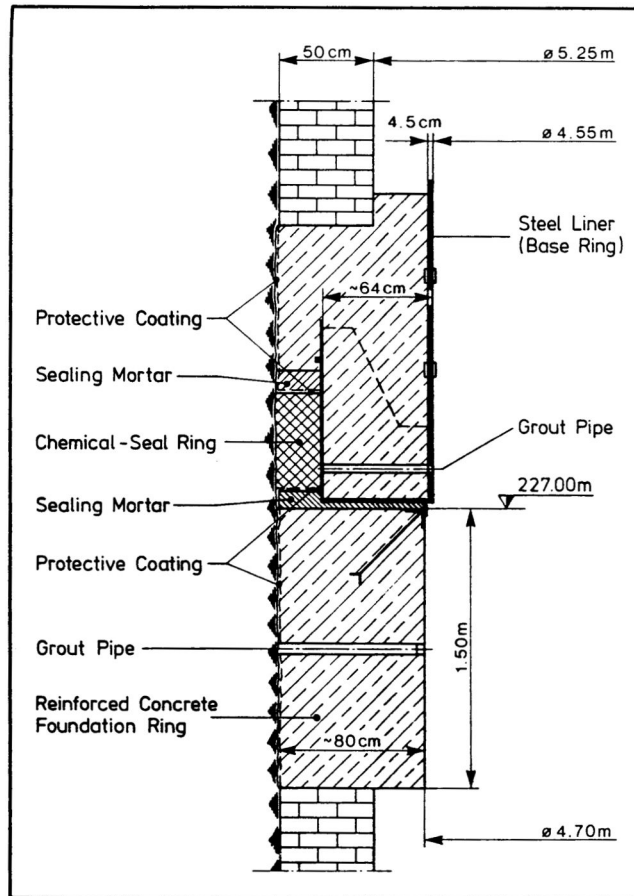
Shaft Salzdefurth 1 Foundation and Sealing System
